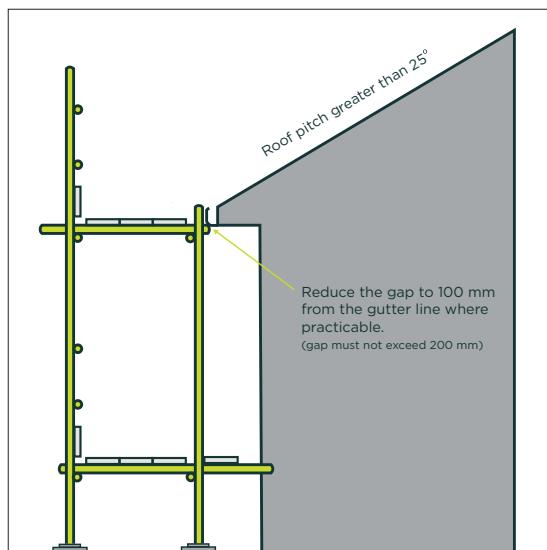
Roof edge protection for a roof pitch greater than 25 degrees
